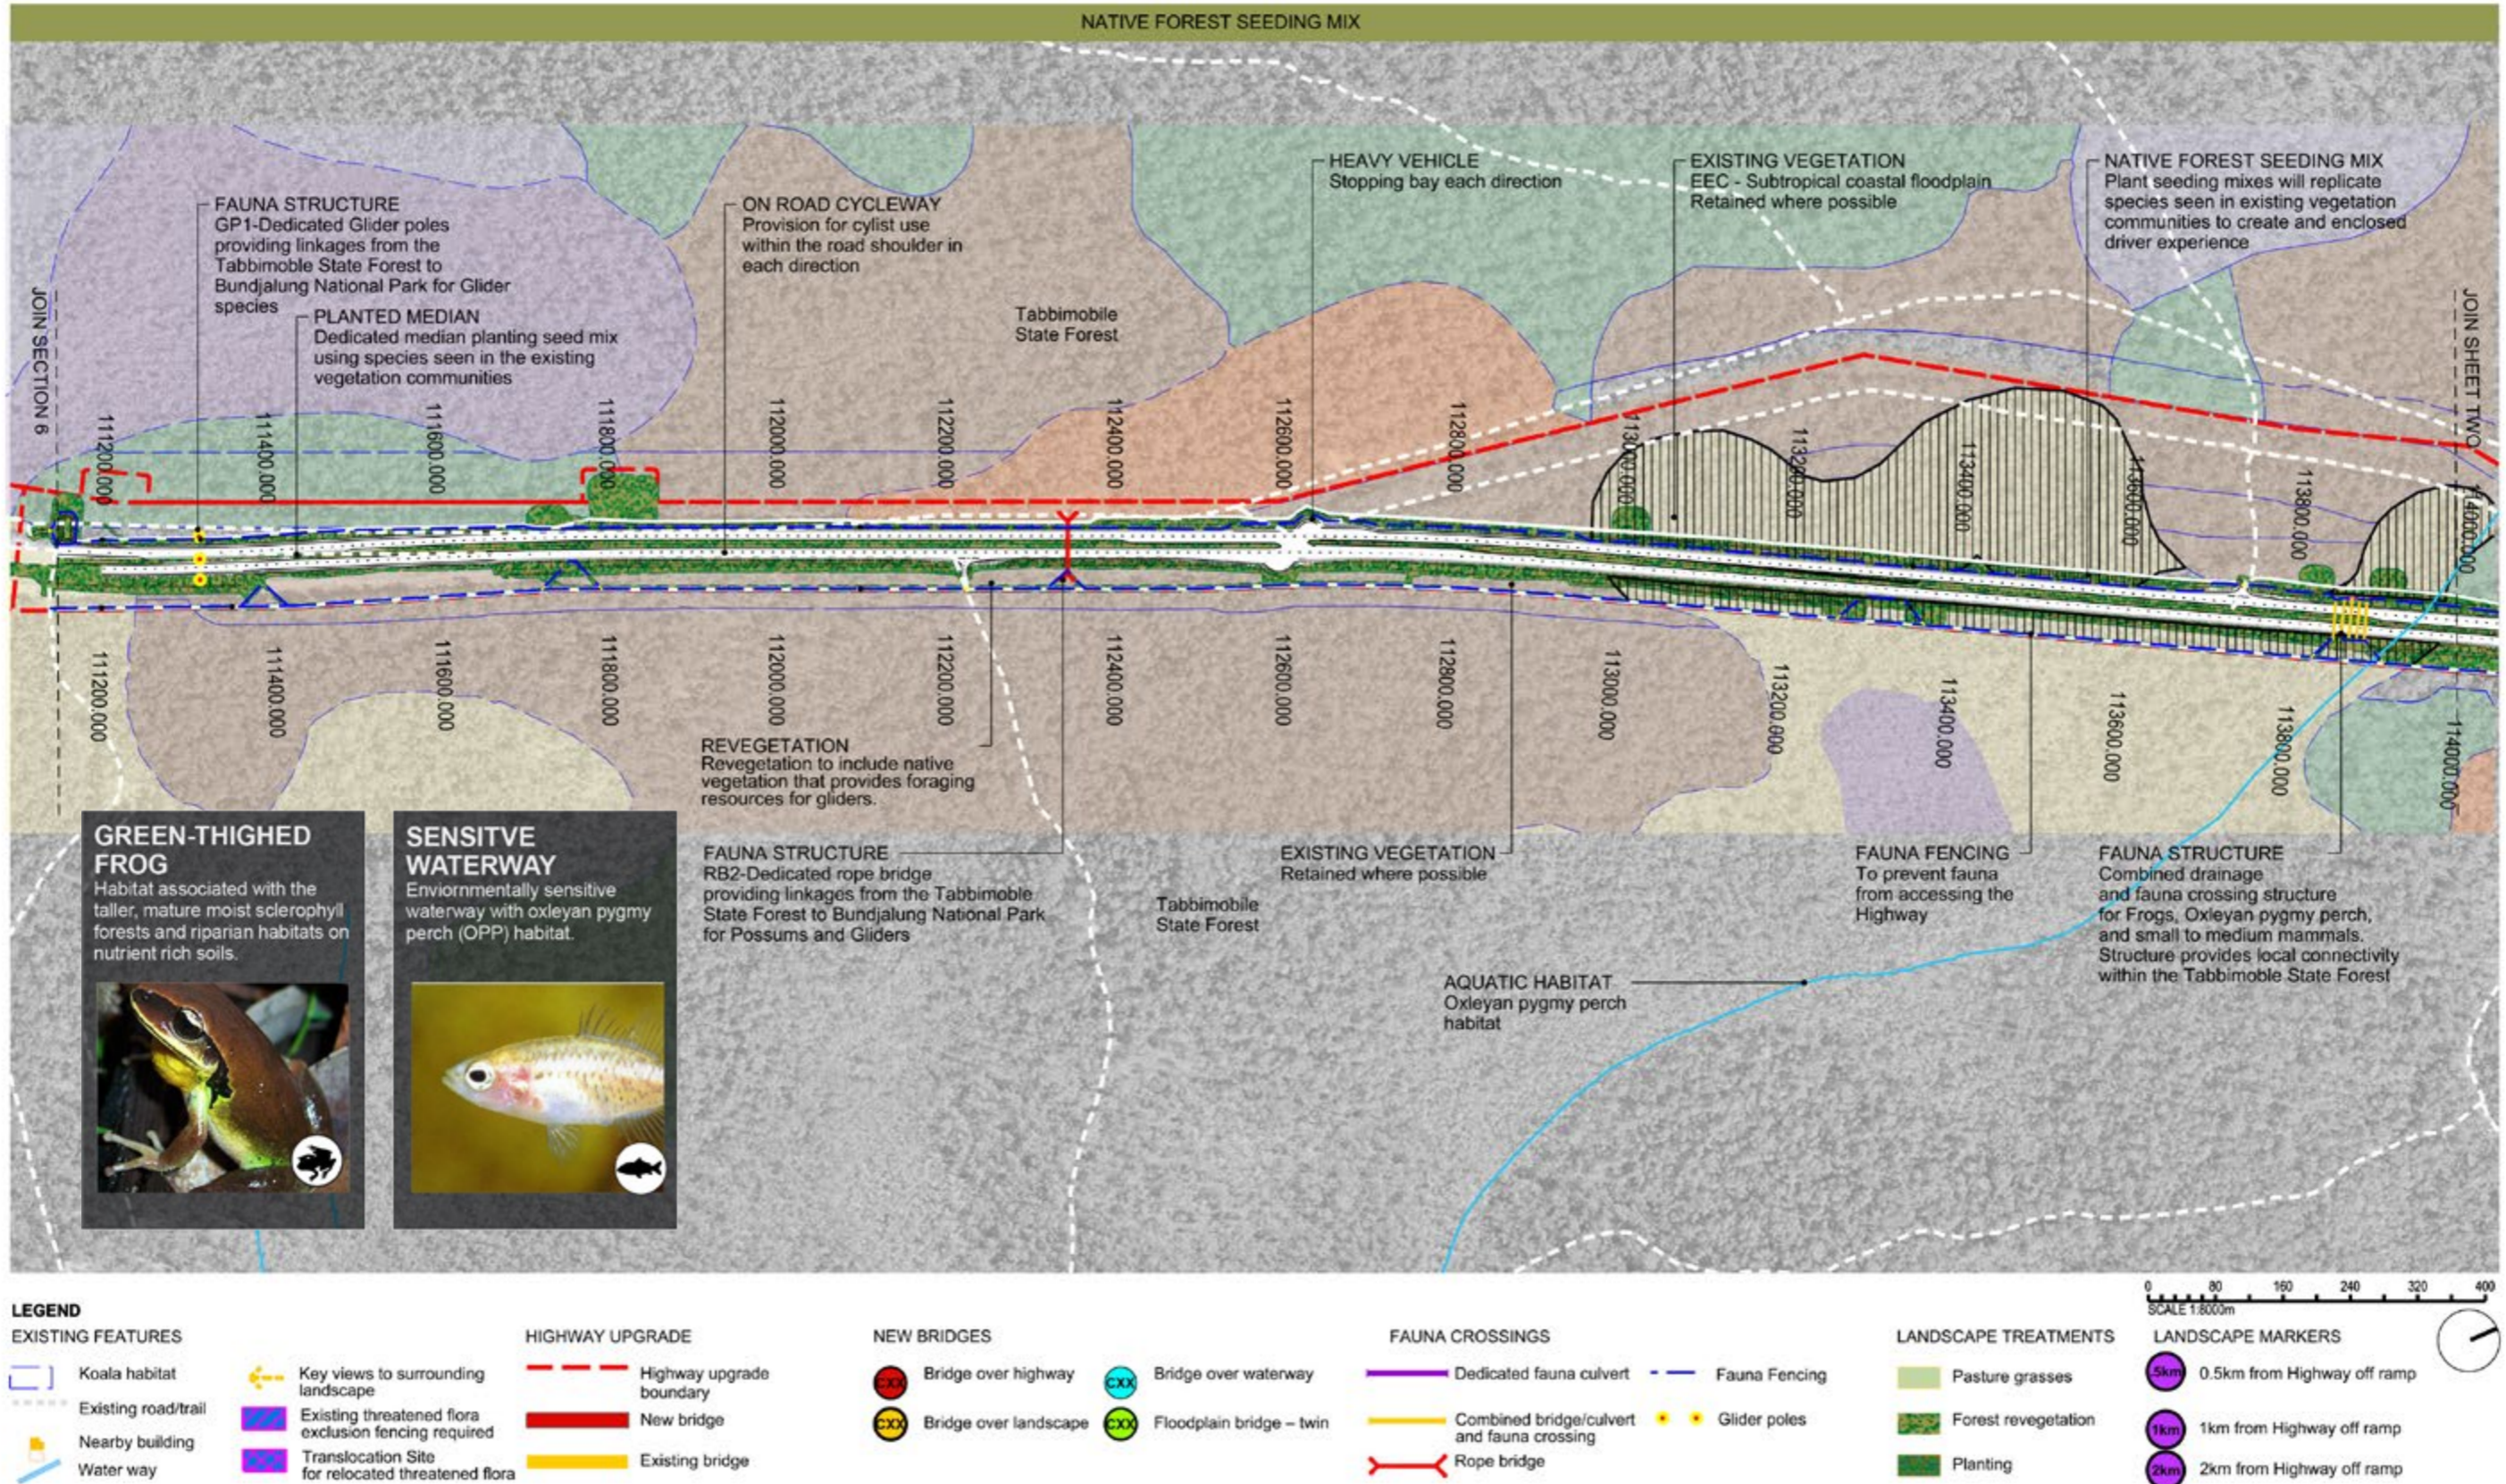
Urban and Landscape Design Strategy Plan – Devils Pulpit to Trustums Hill – Sheet 1
